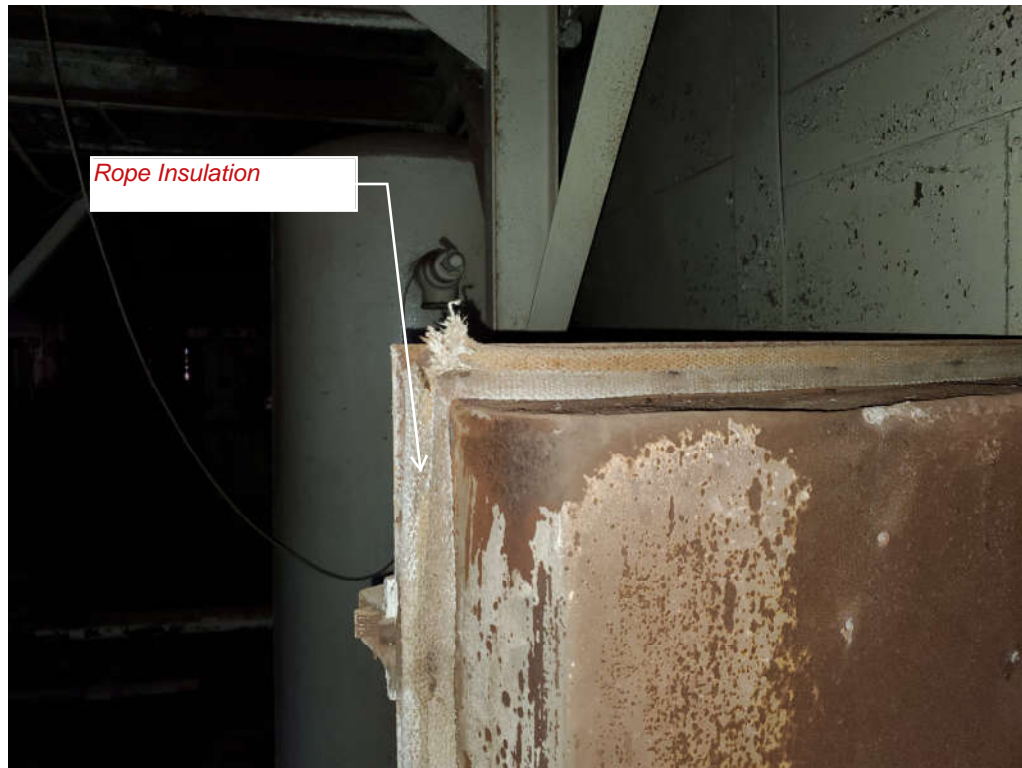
View of white rope door insulation (HA 69) in the joint building.
